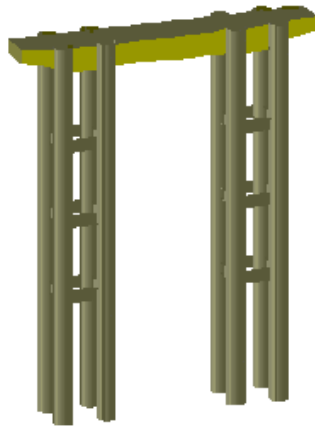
Steel pipe integrated Rahmen pier (Proposed Type)
